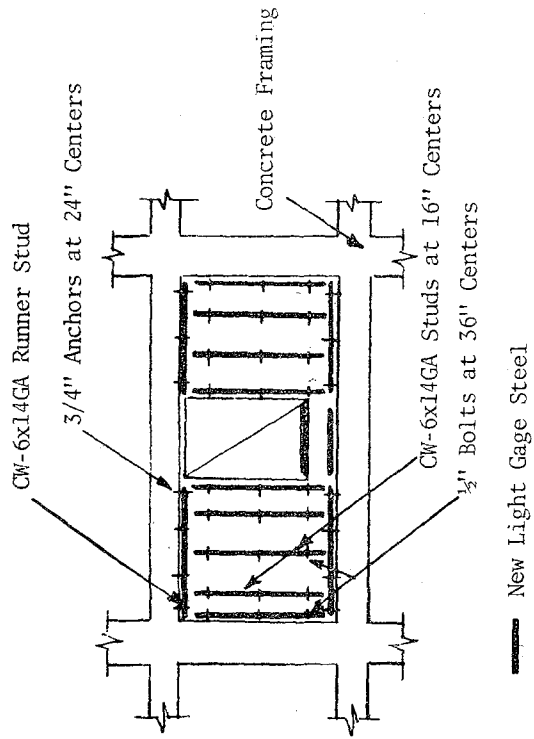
(c) STEEL STUD FRAMEWORK FOR EXTERIOR MASONRY WALLS
